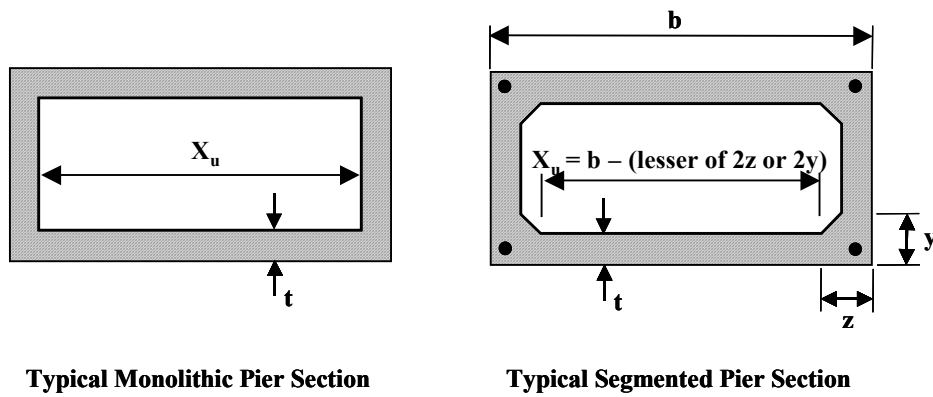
Definition of the Wall Slenderness Ratio for a Hollow Rectangular Cross-Section (AASHTO 1998)
